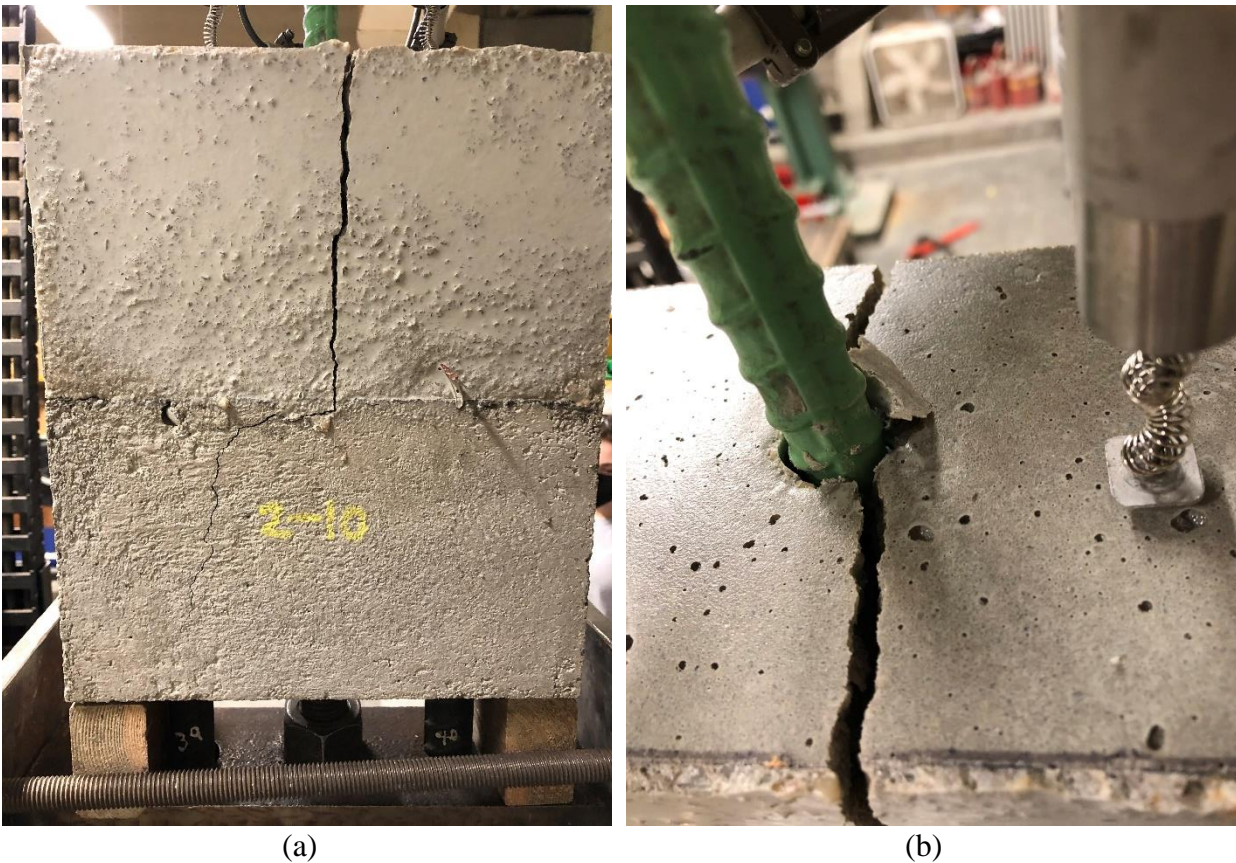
(a) Elevation view of splitting failure, 2-10, (b) Splitting at top of HCSC, 2-10
